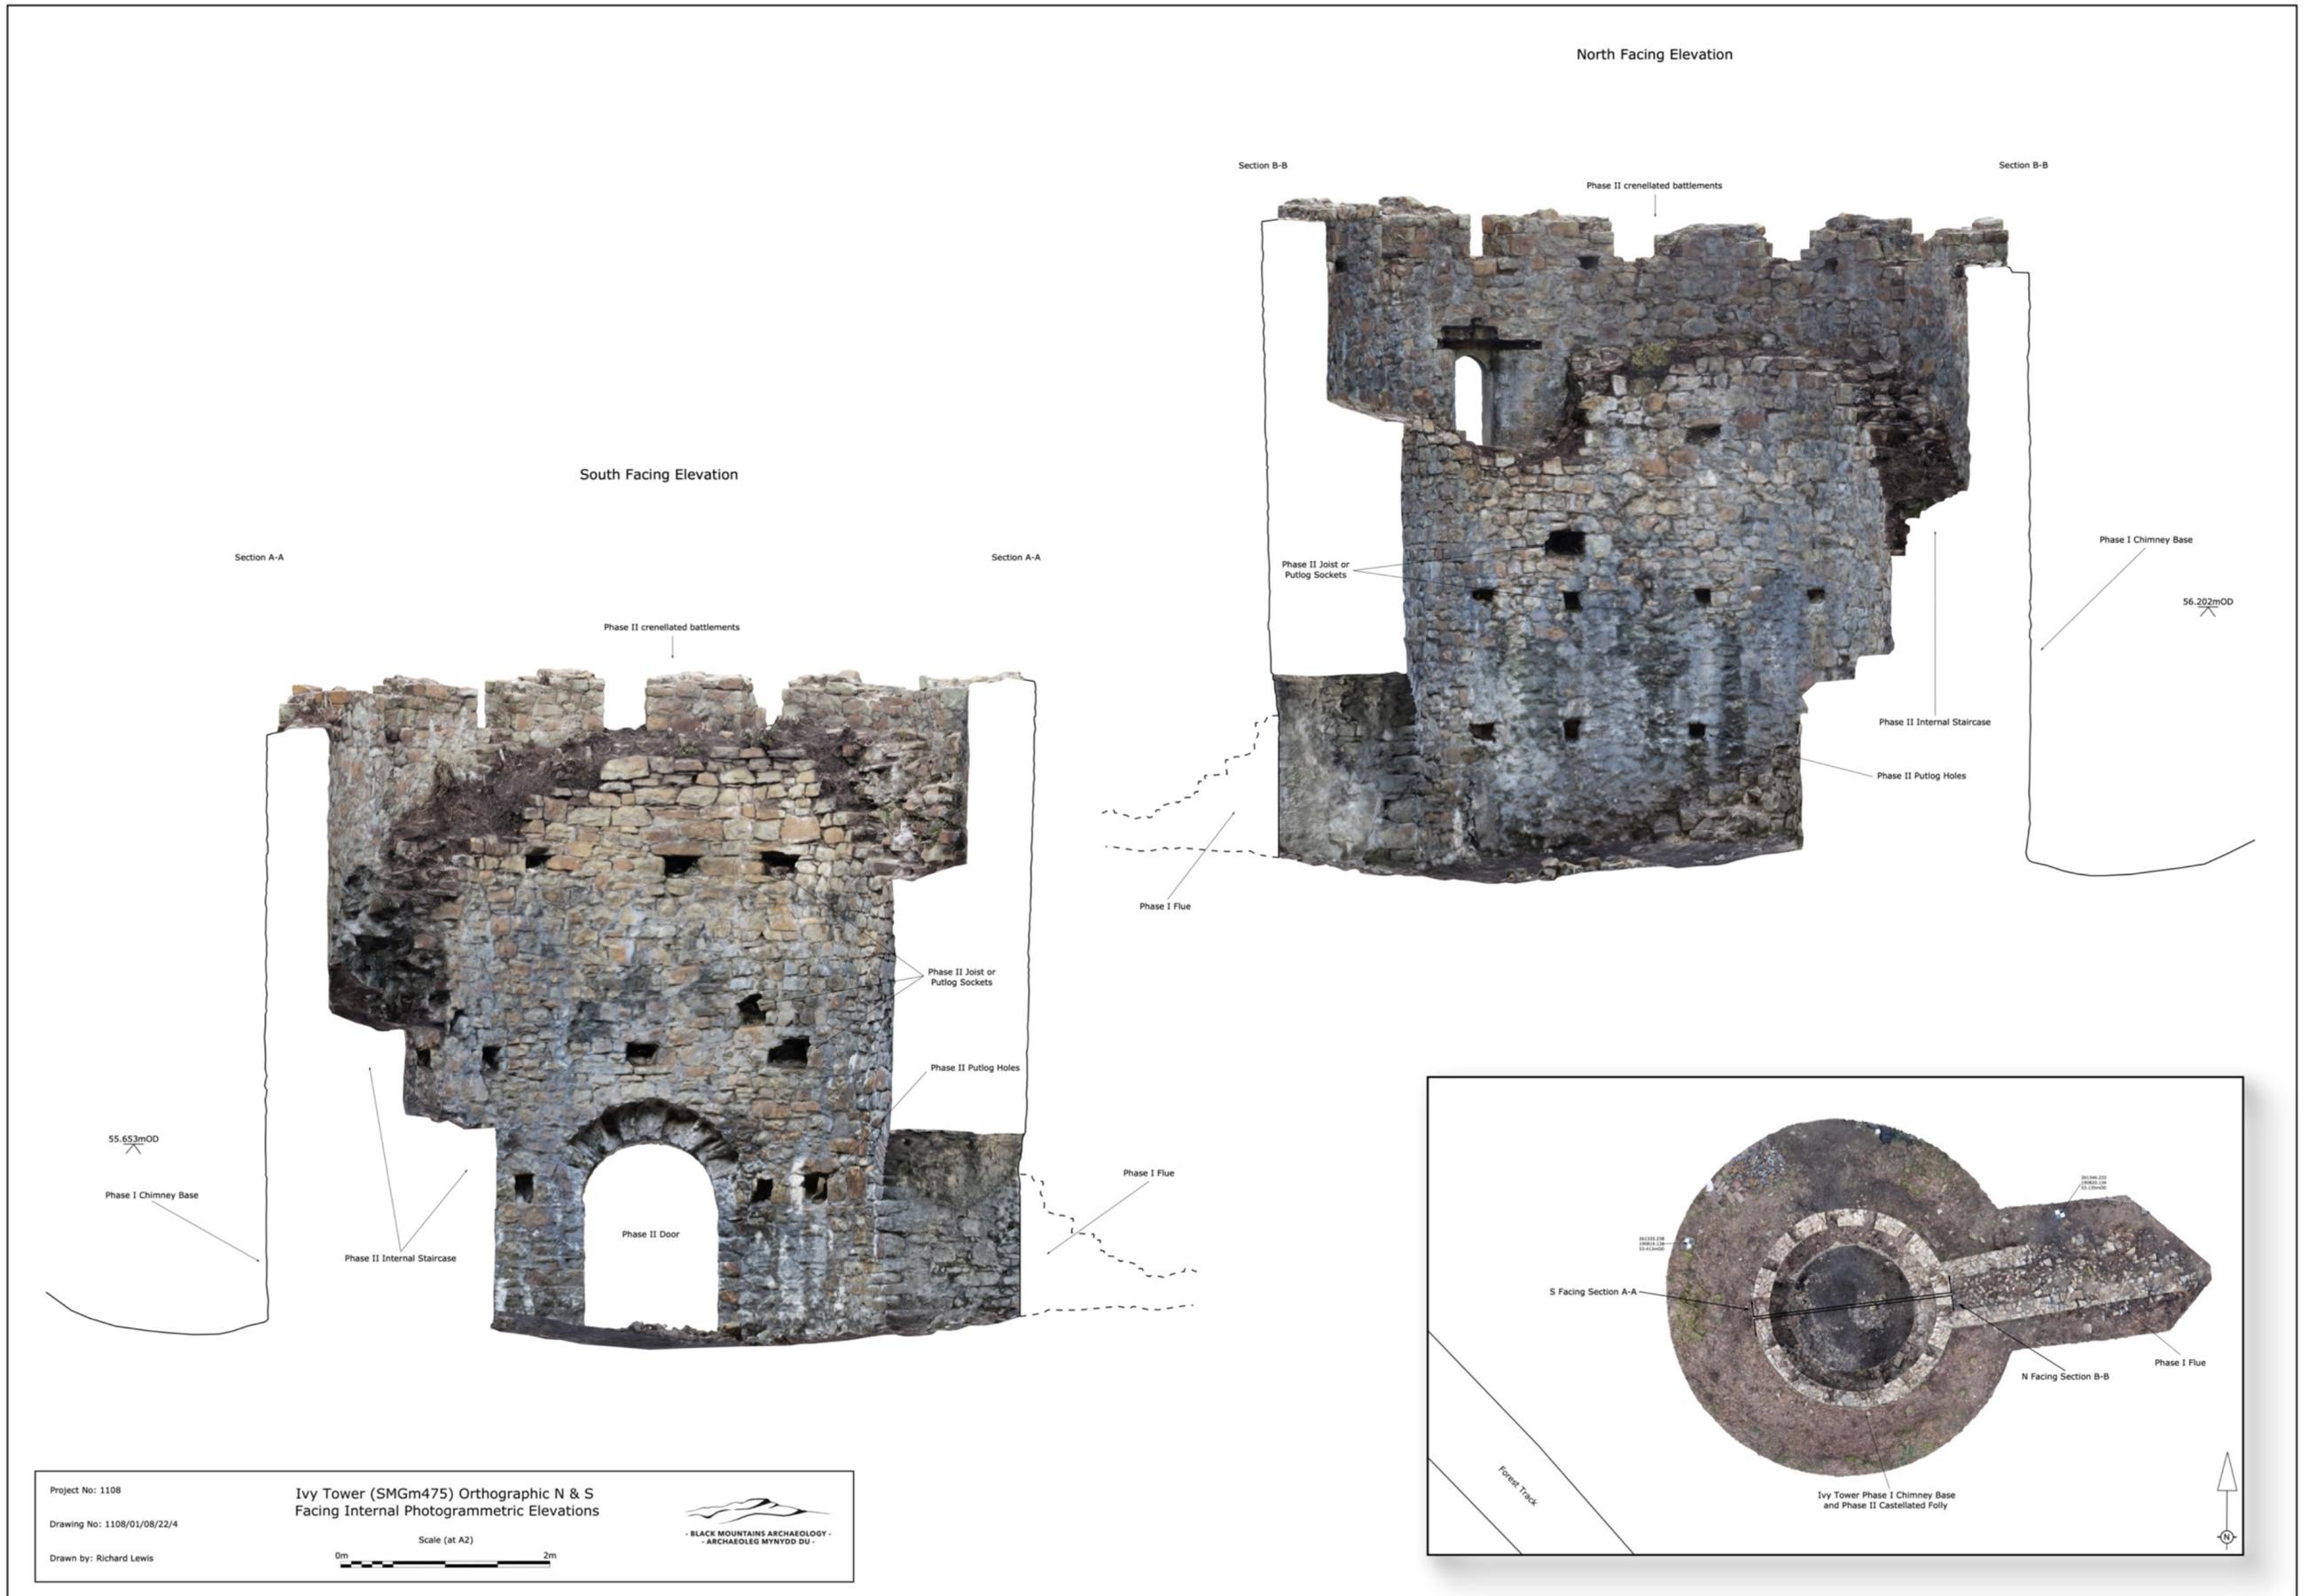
Ivy Tower Orthographic North and South Facing Internal Photogrammetric Elevations.
